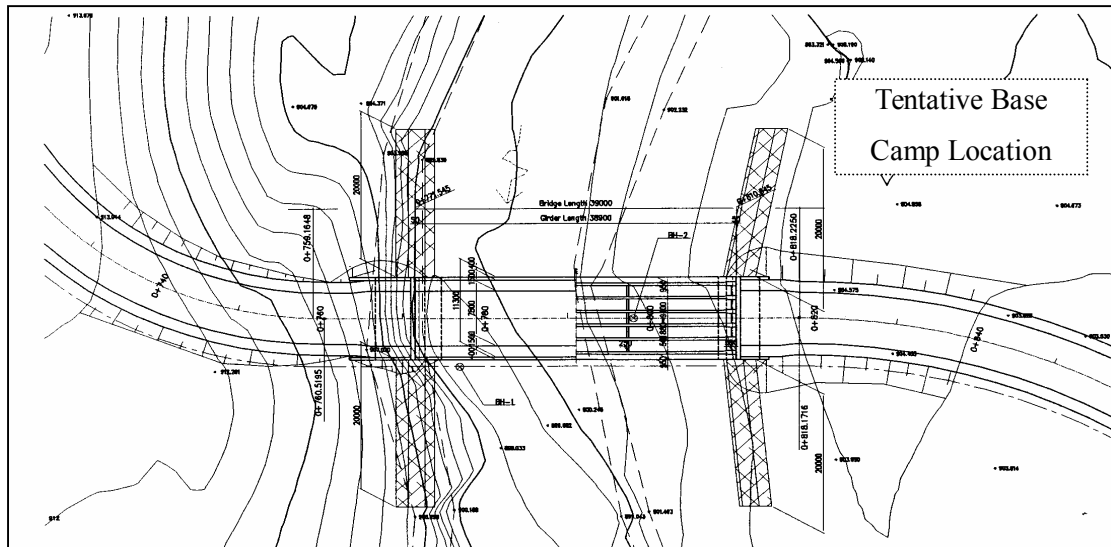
Location Plan of Base Camp in Gindae Bridge Construction Site
